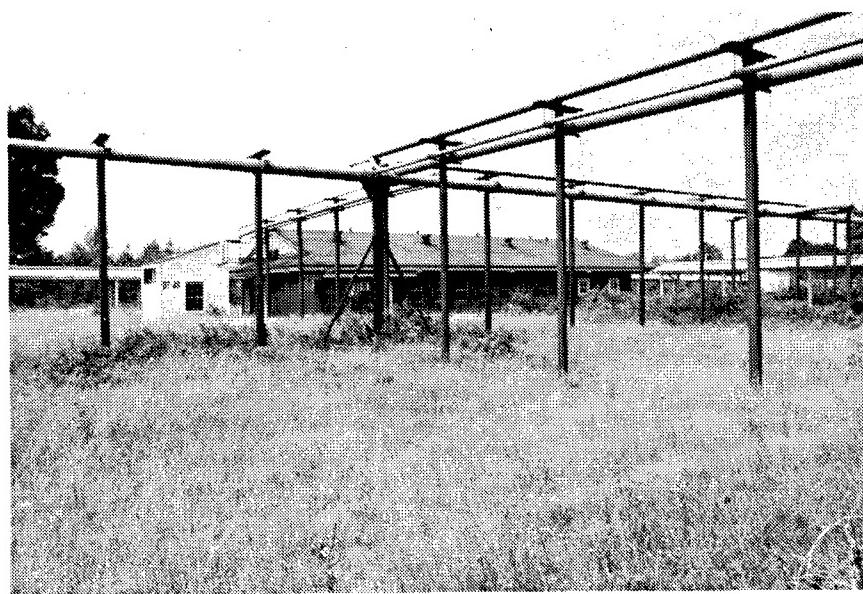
Building DT-48 and Building DT-16: Metal Parts Loading Buildings.
